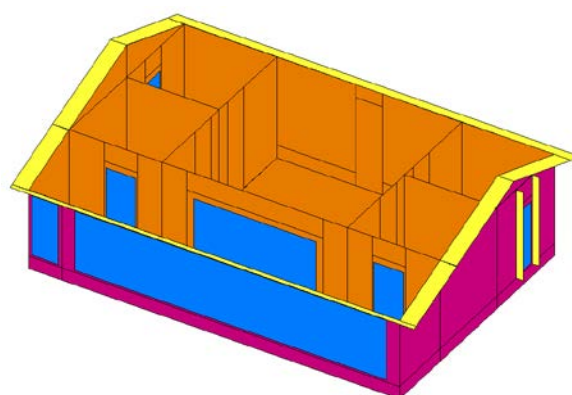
Passive house, rammed earth with shading: with winter garden in front on the north side
